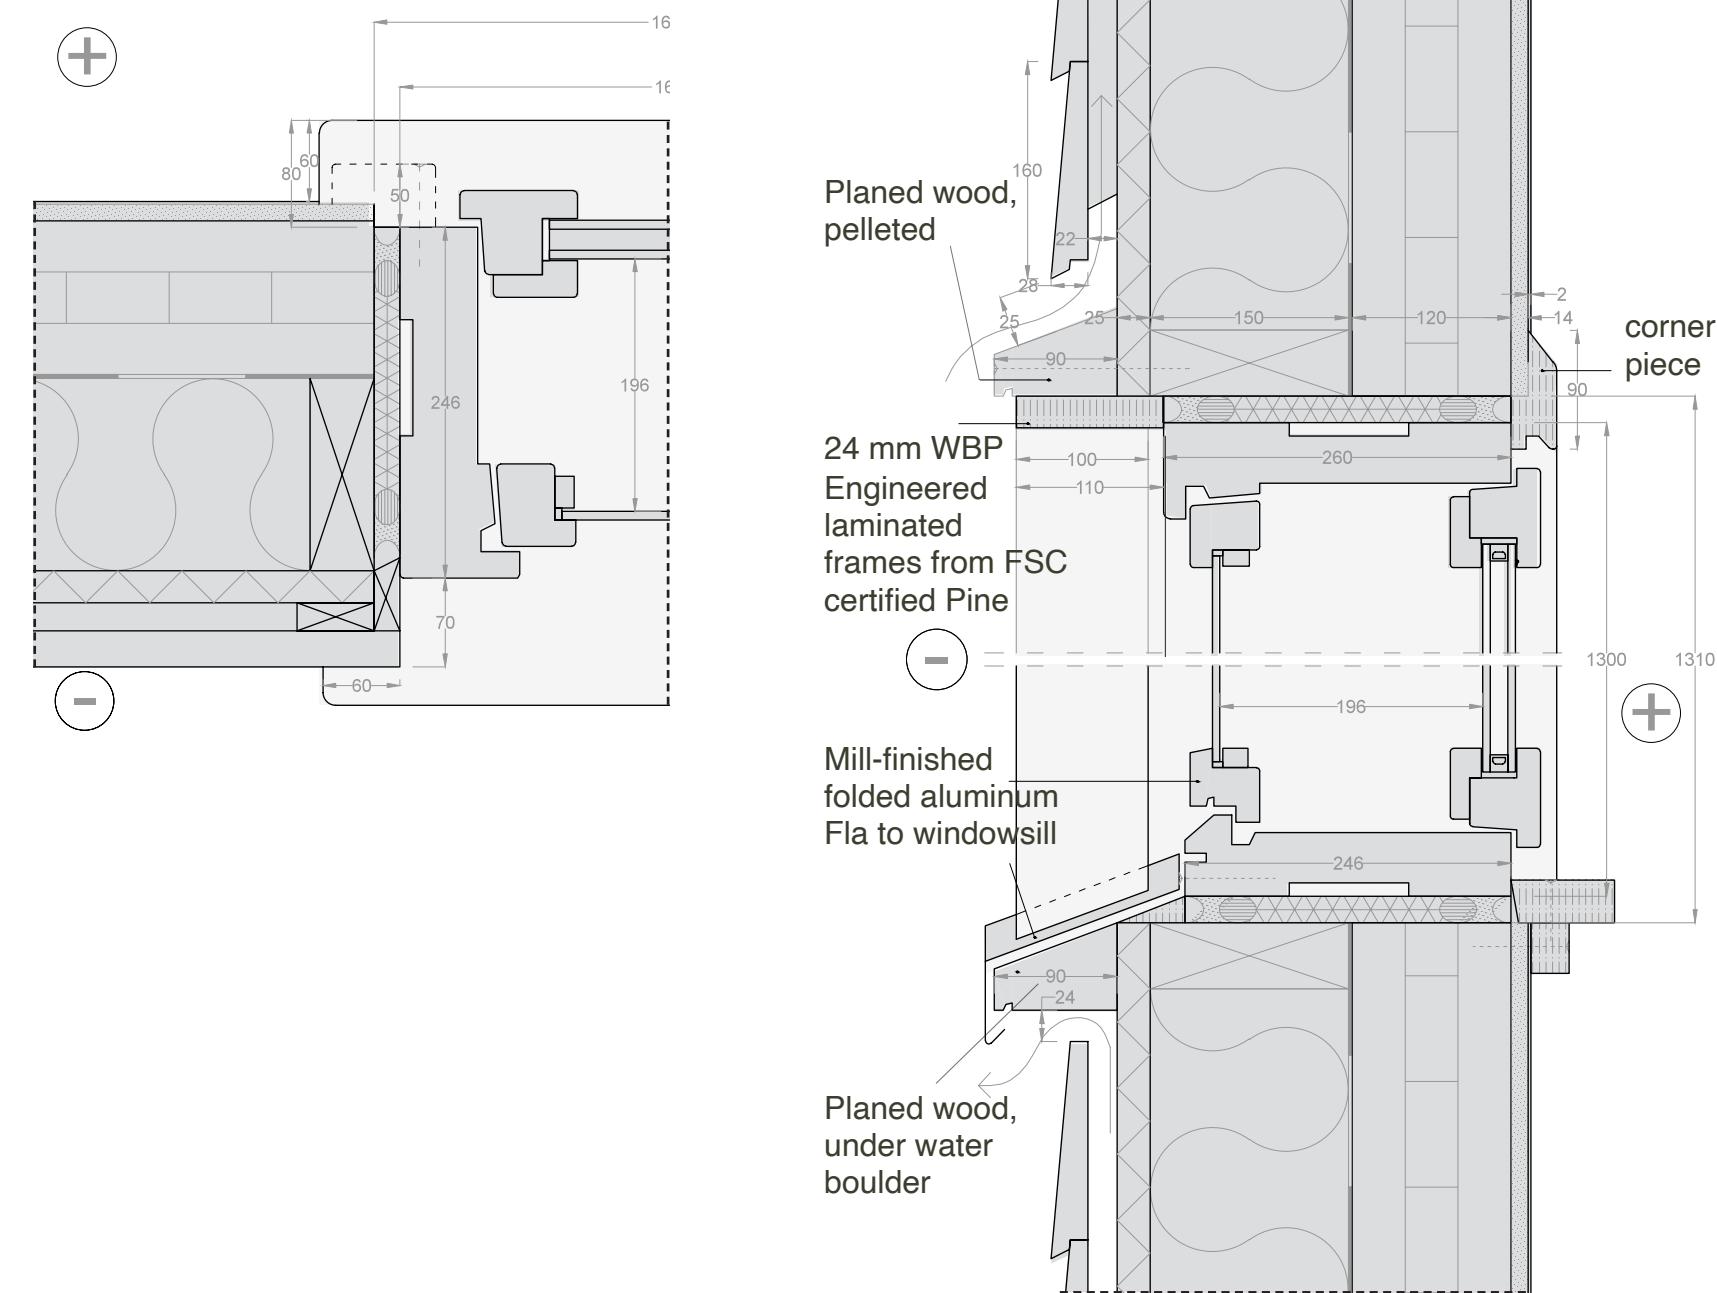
W01 fitting diagram, horizontal section on left, vertical section on right
